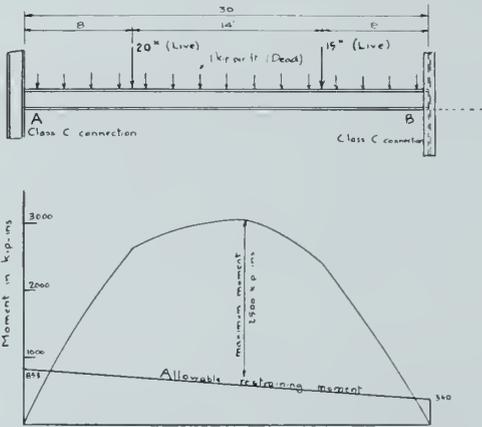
Design of girder having unsymmetrical loads and restraints.
